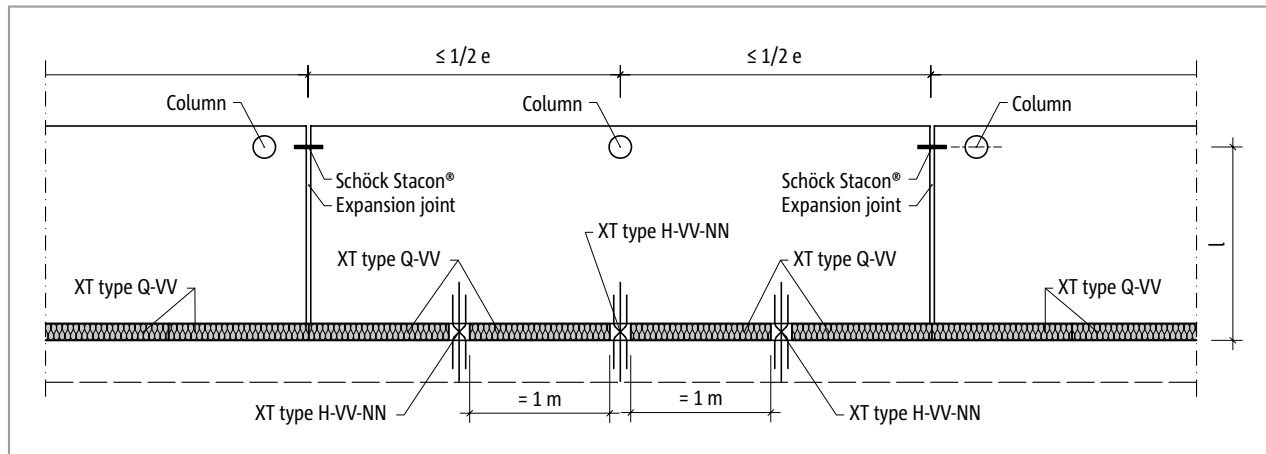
Schöck Isokorb® XT type H: Expansion joint arrangement
